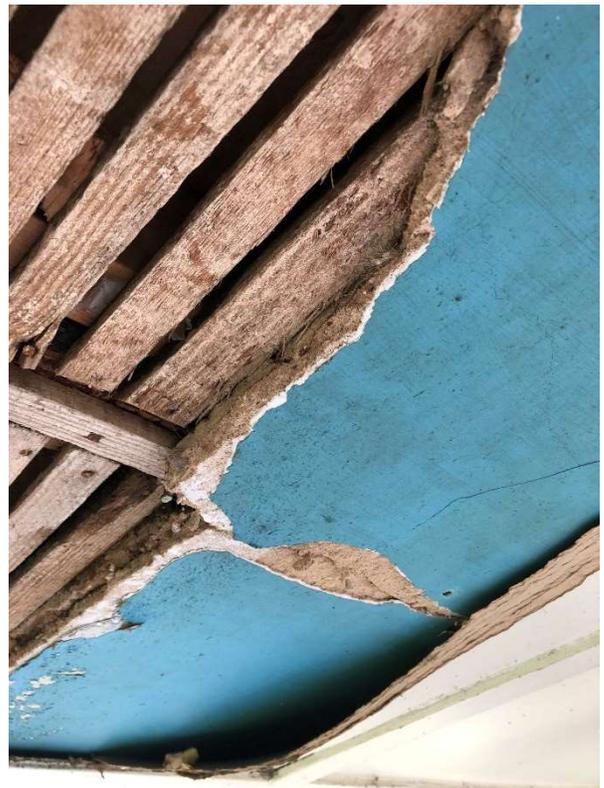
515 S. Rock Street, historic plaster porch ceiling revealed, close up, 2024.
